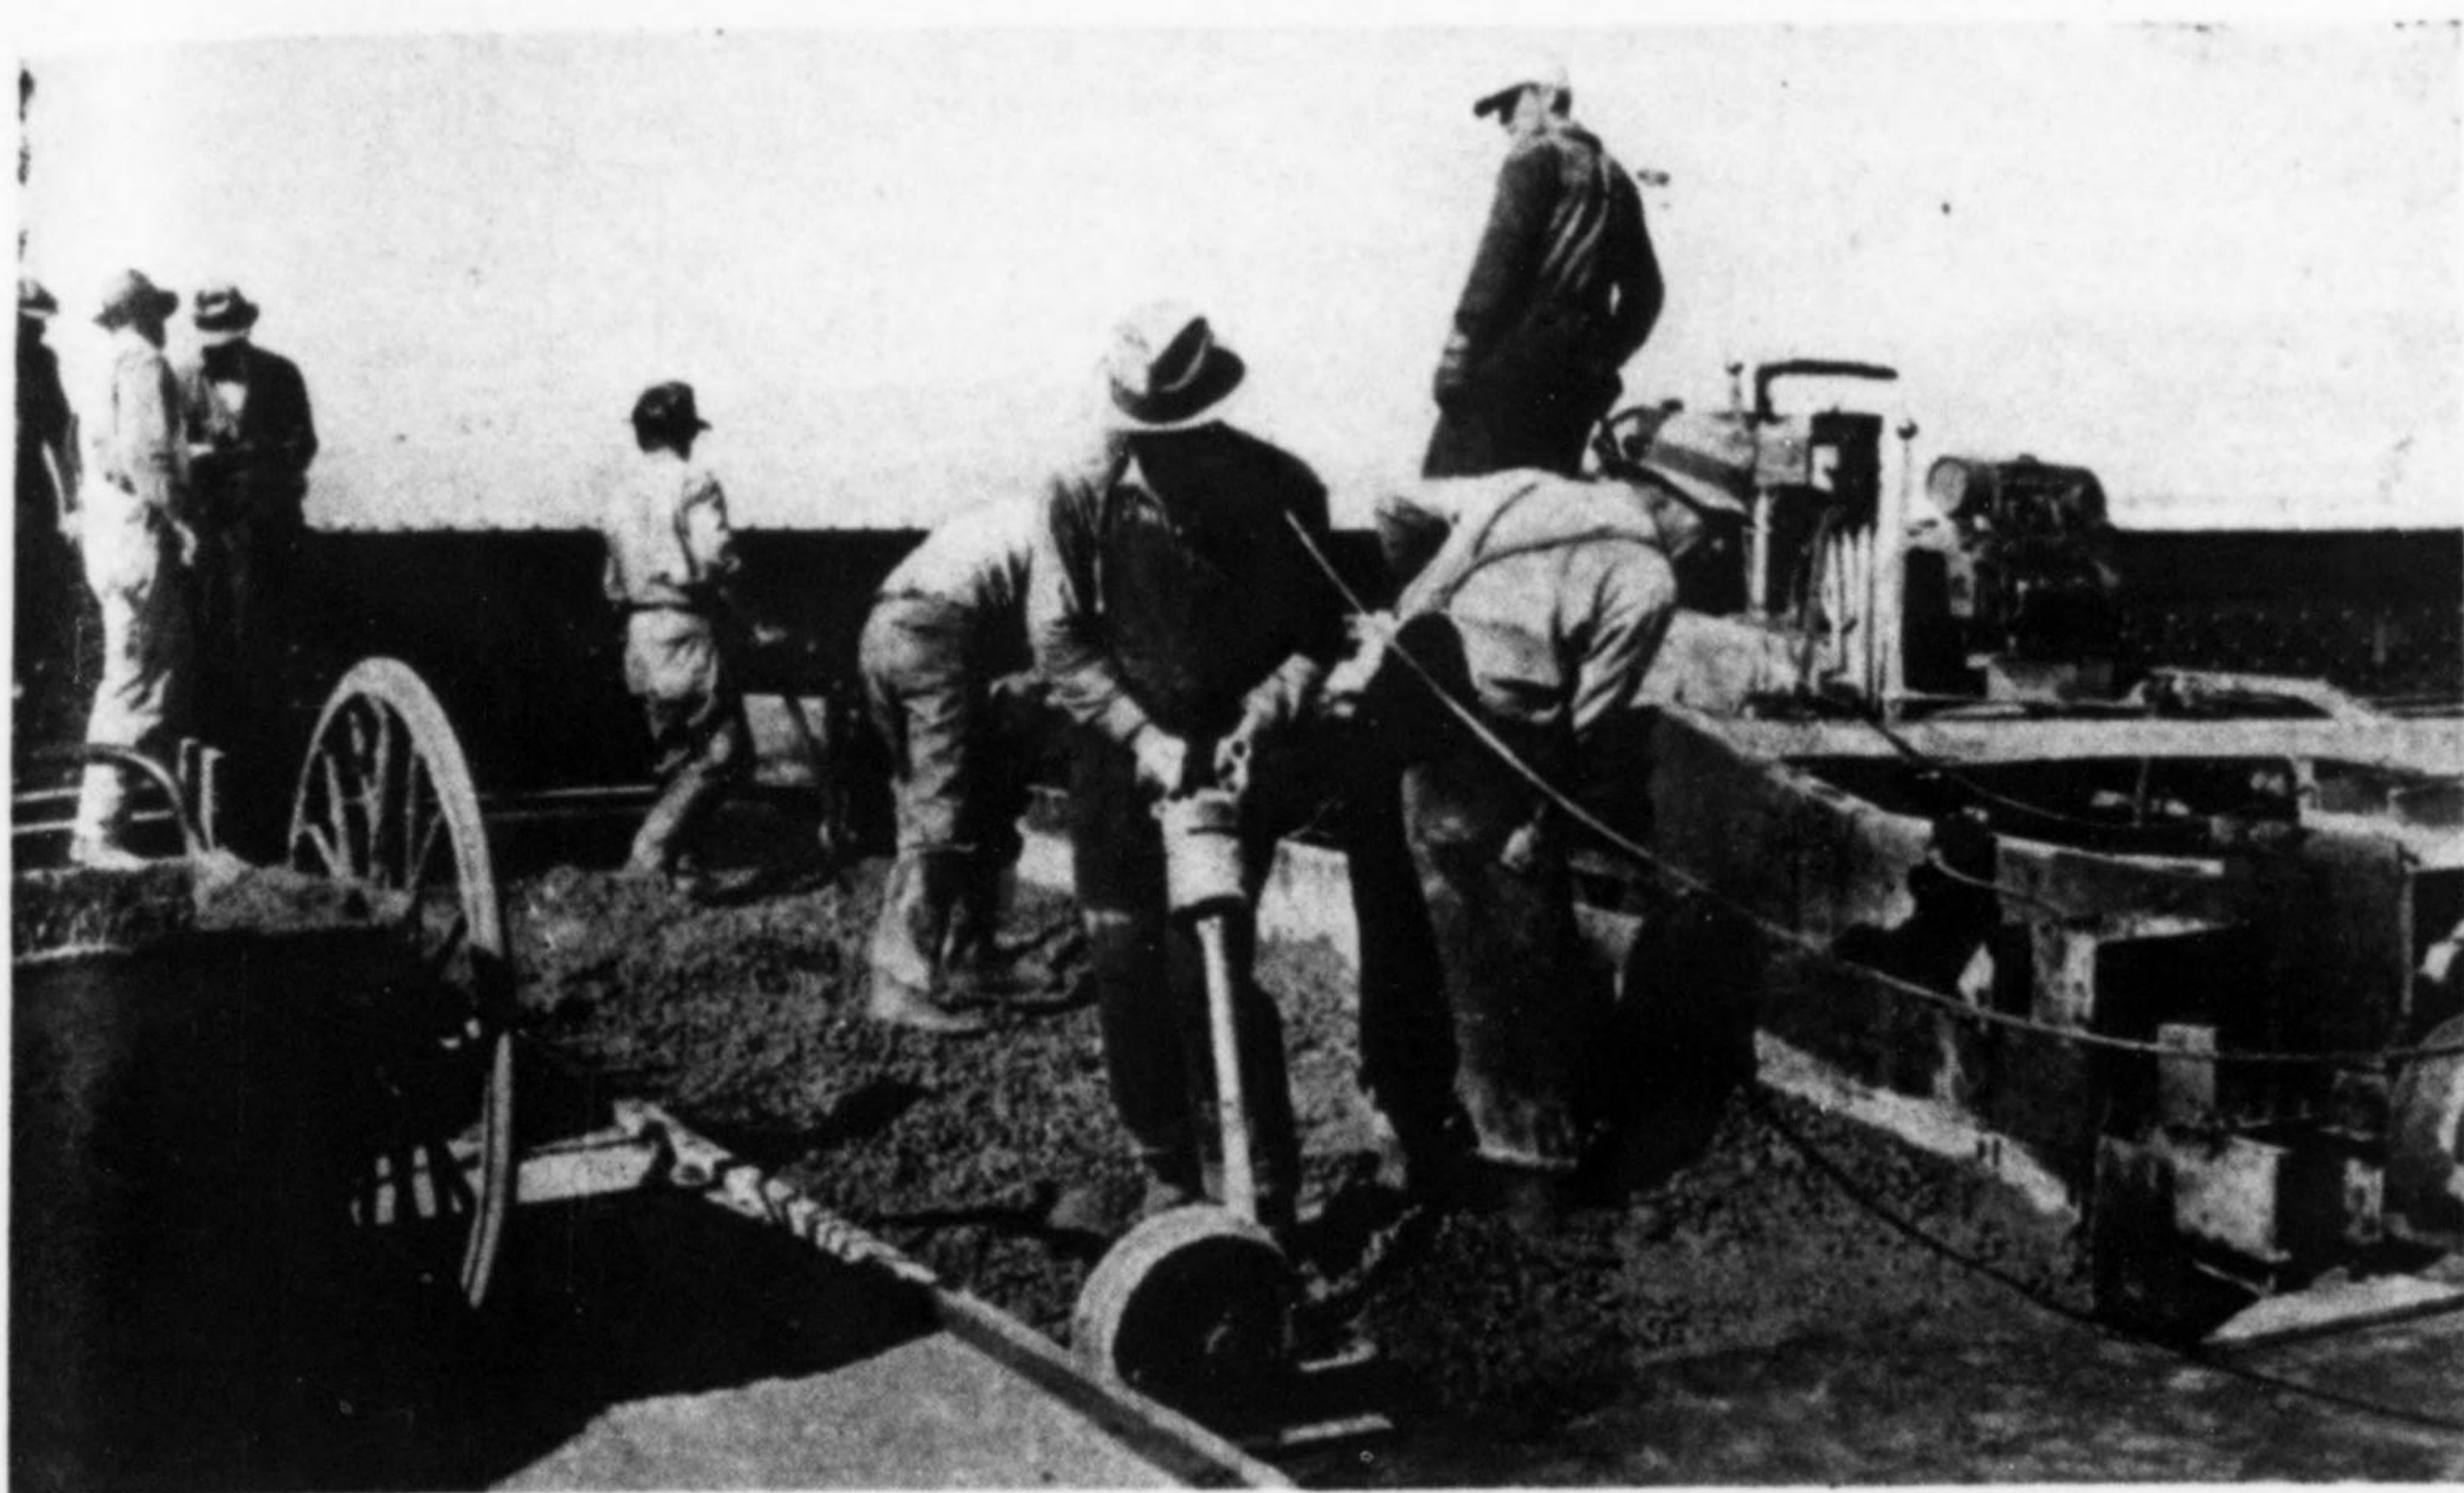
PLACING LIGHT-WEIGHT CONCRETE on upper deck roadway. Hand vibrators were used in addition to mechanical vibrators mounted on the finishing machine in the background.
